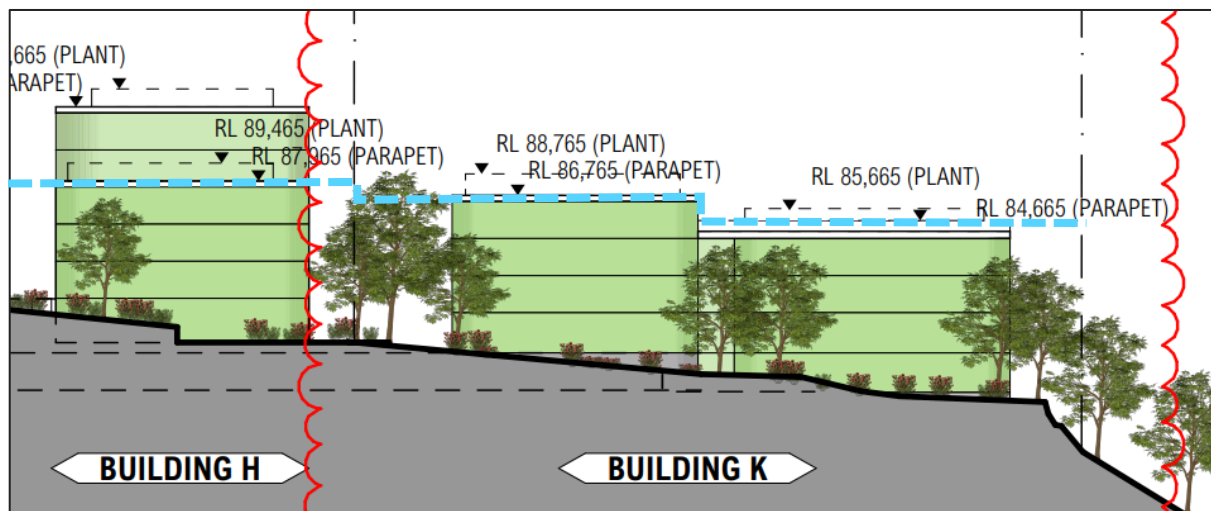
| Western (Richmond Avenue) elevation of building envelopes with street facing parapet line shown in blue (Base image source: SRtS)
